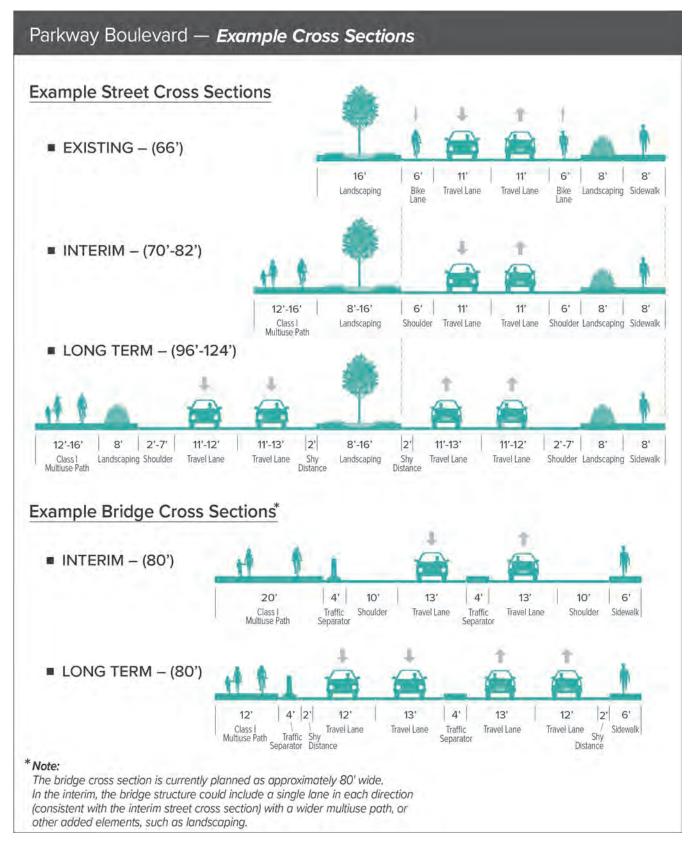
EXAMPLE PARKWAY BOULEVARD CROSS SECTION
